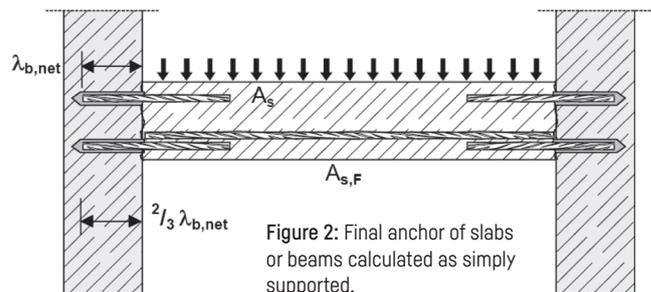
Final anchor of slabs or beams calculated as simply supported.
